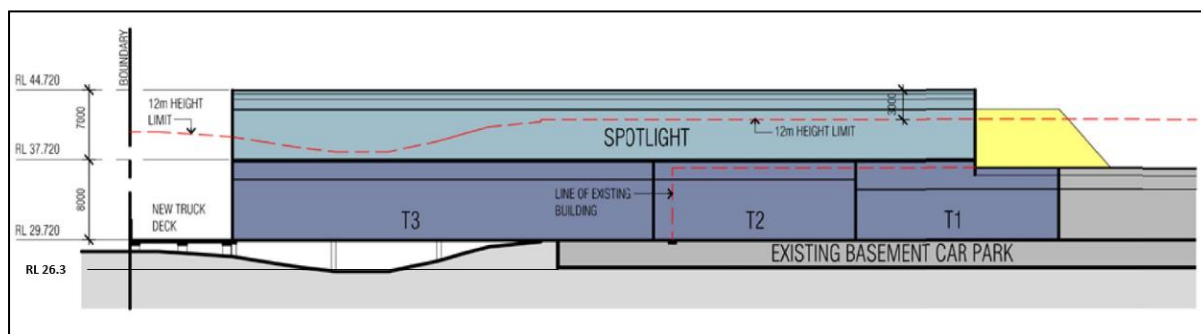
Penrith Homemaker Centre Ground Floor Section
